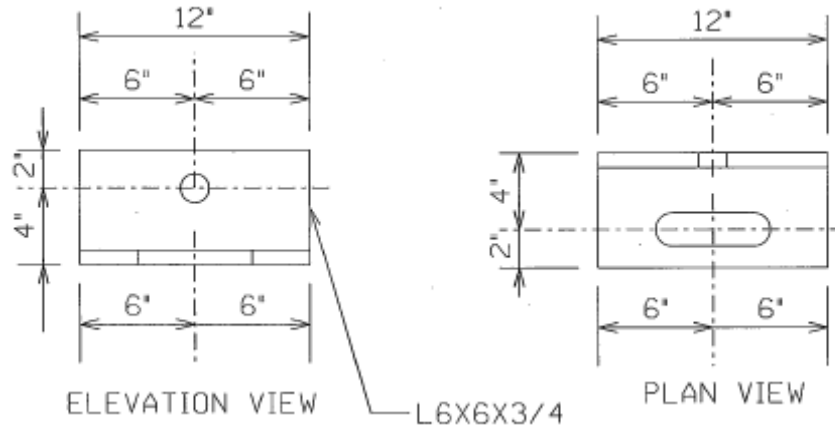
Oseligee Creek Bridge Abutment Connection (Expansion)
